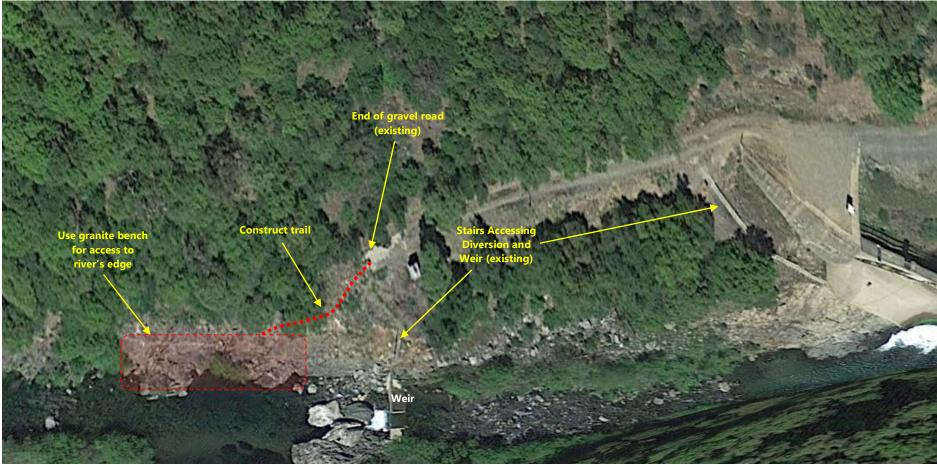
Proposed whitewater boating put-in improvements below the diversion dam and weir.
